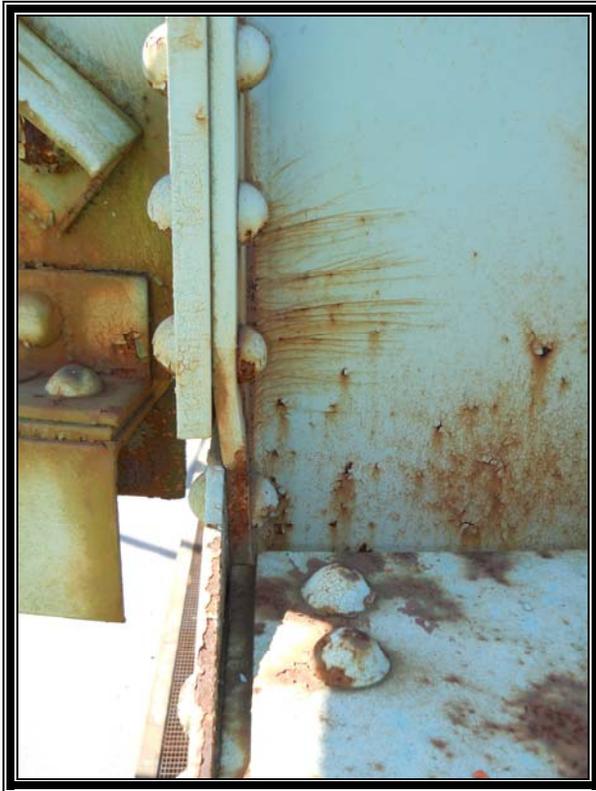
Span 2 North Truss Vertical Member U3-L3 Flange Damage
